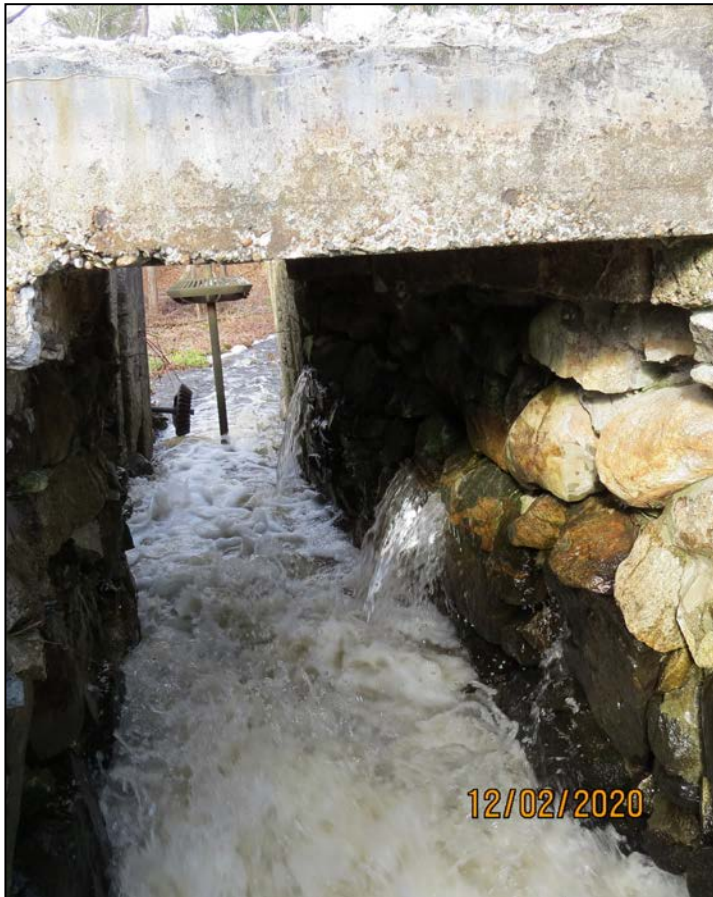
Flow through right training wall (Taken on 12/2; provided by Town).
